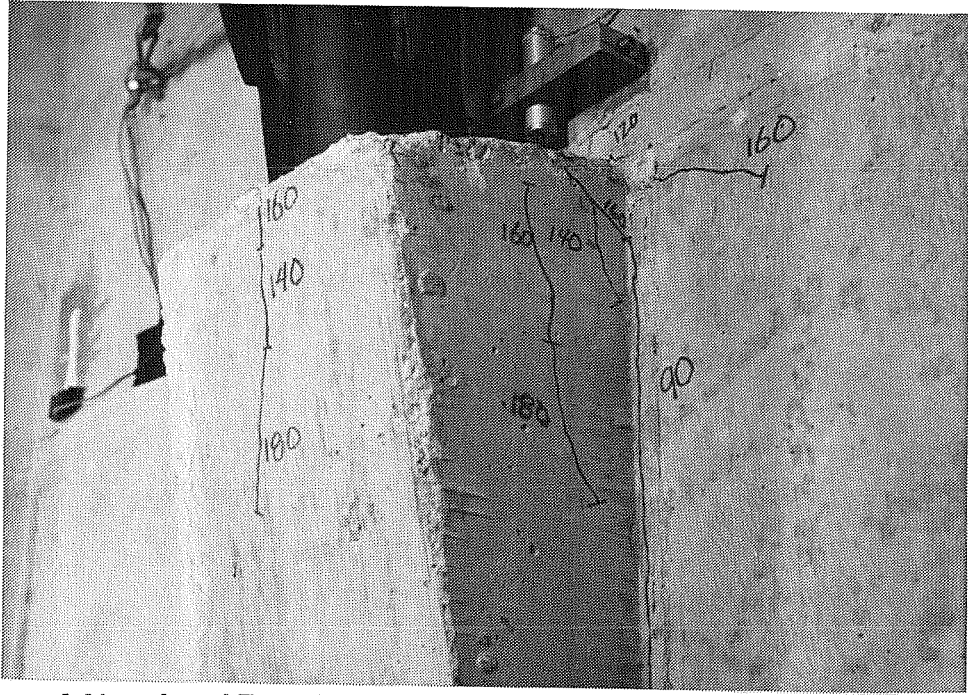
Local Zone Cracks in Specimen Blister2 at 75% of the Failure Load
